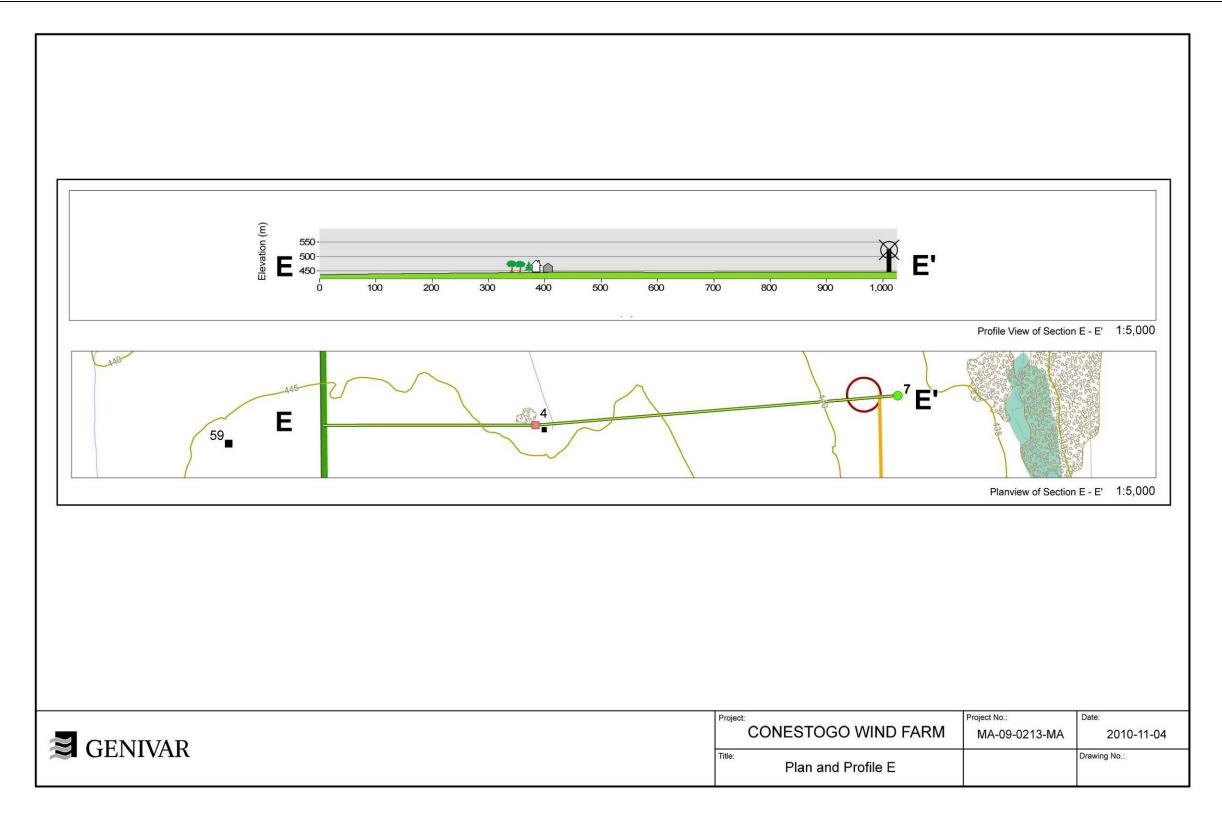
Plan and profile drawings of CHL 5 illustrating general landscape composition of lot with respect to height of existing structures.
